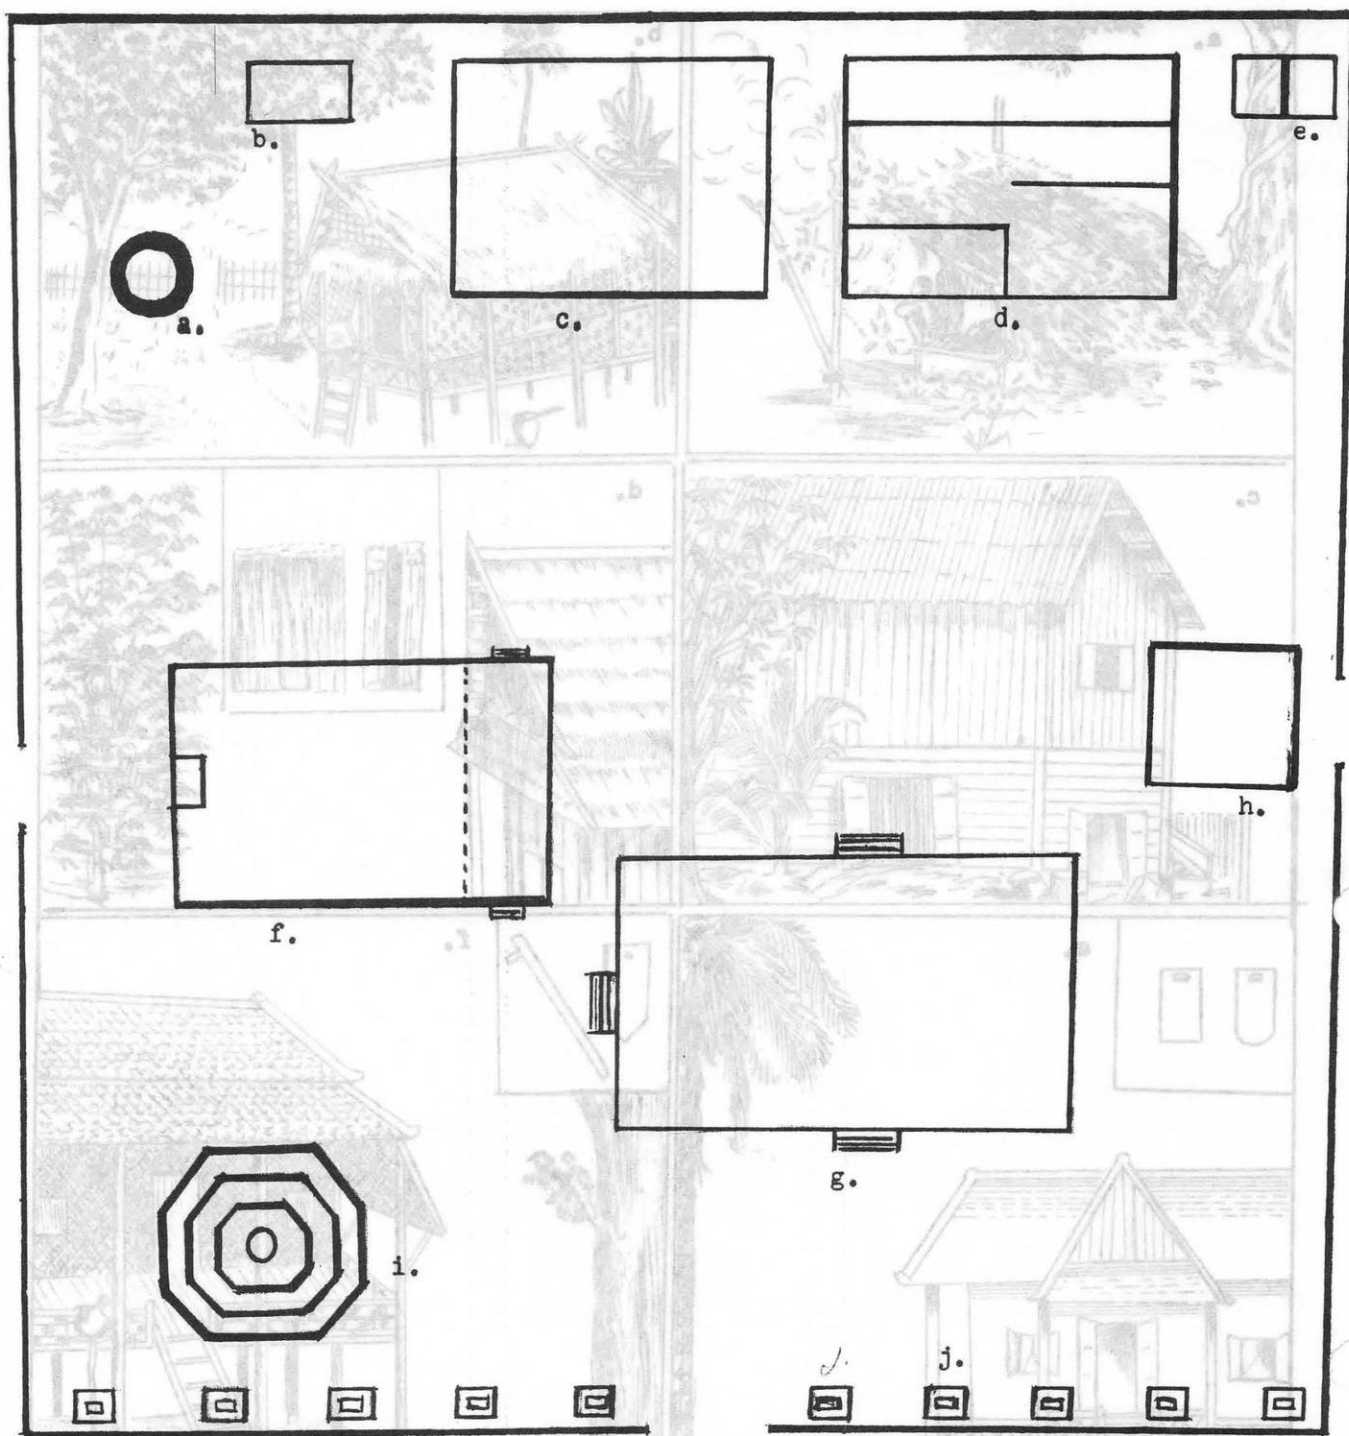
A typical wat (buddhist space) or buddhist monastery: a. nam sang (water-construction) well; b. souam ap (room-bath) bathroom; c. kou dee (building-good) monks' dormitory; d. kou tee (building-critic) senior dormitory; e. souam thay (room-change) water closet; f. bod (buddha-shrine) monastery; g. ho cheik (building-distribution) meeting house; h. ho lakhang (tower-bell) bell tower; i. pha that (relic-temple) pagoda; j. that douk (shrine-bone) burial shrines.
